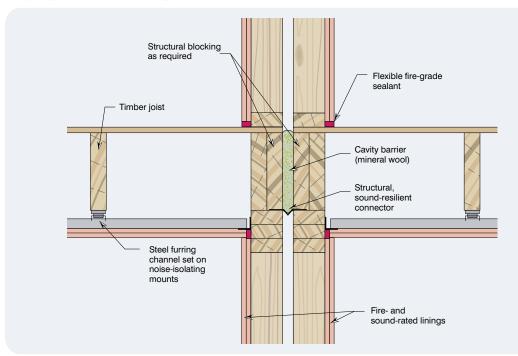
Joists running parallel to bounding wall - elevation view.
